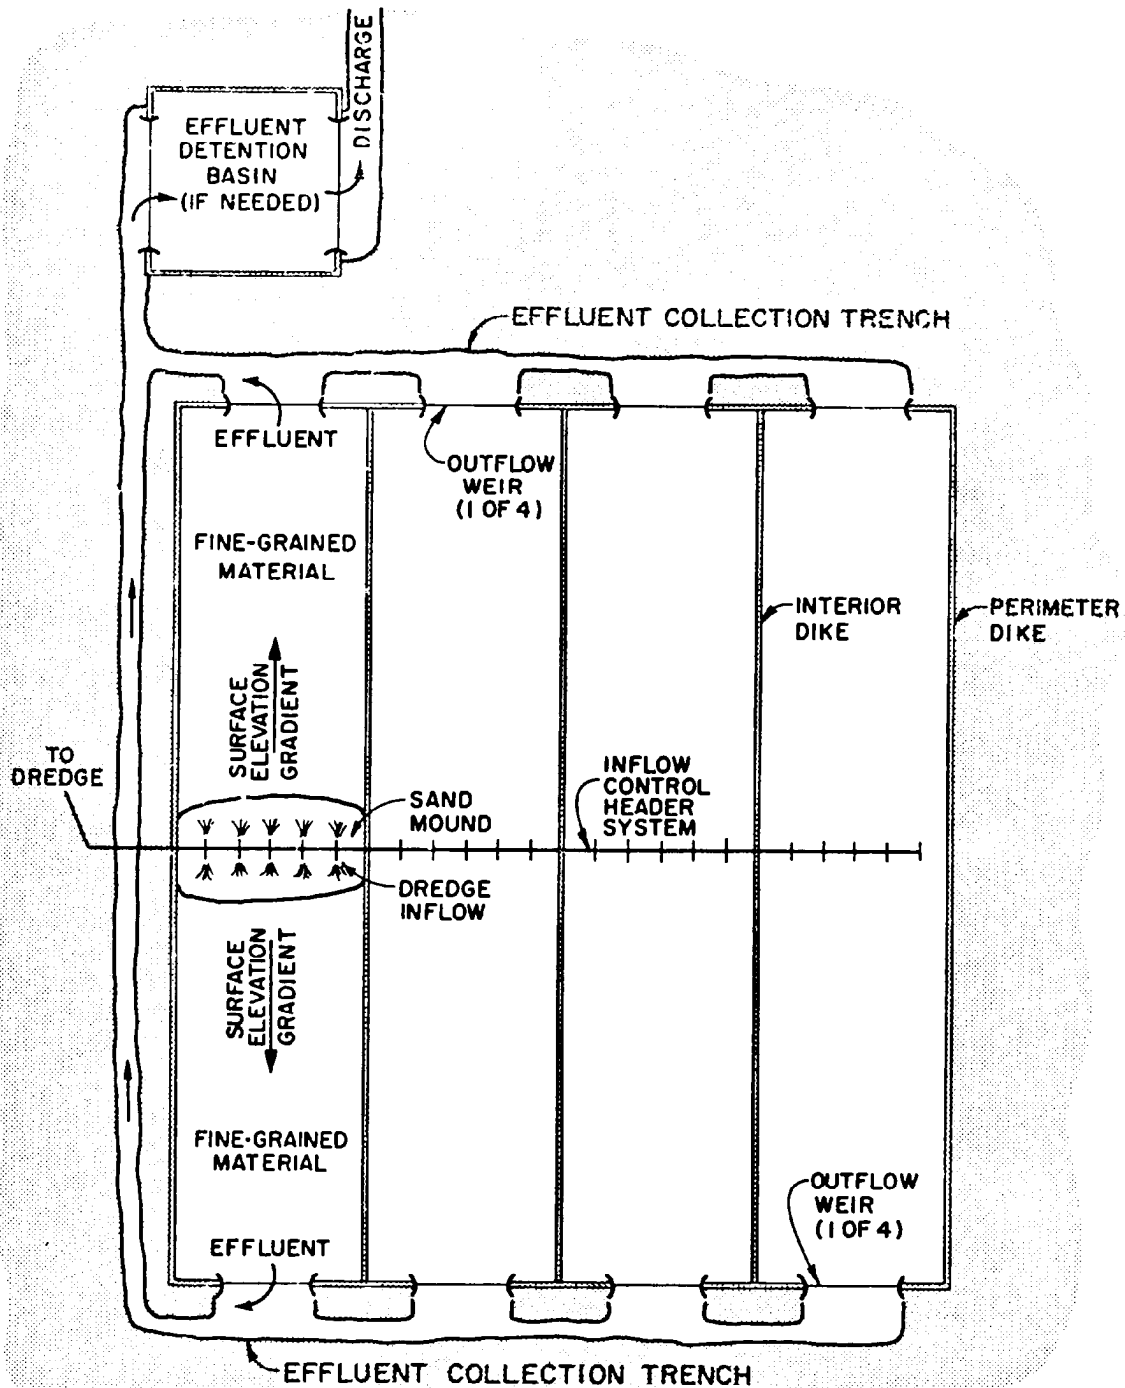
Conceptual illustration of disposal site layout to permit parallel compartment use and produce surface topography facilitating future dredged material dewatering
